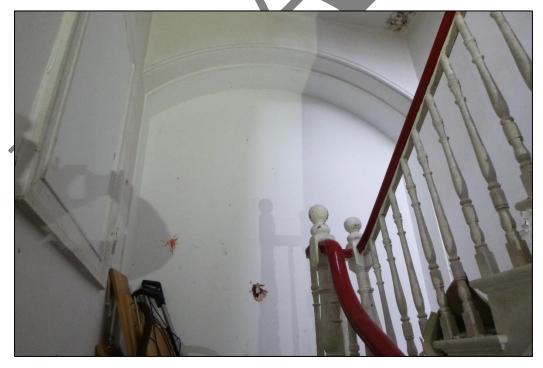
Stairwell landing at ground floor level showing blocked wide segmental arched ope (18.02.2025).
